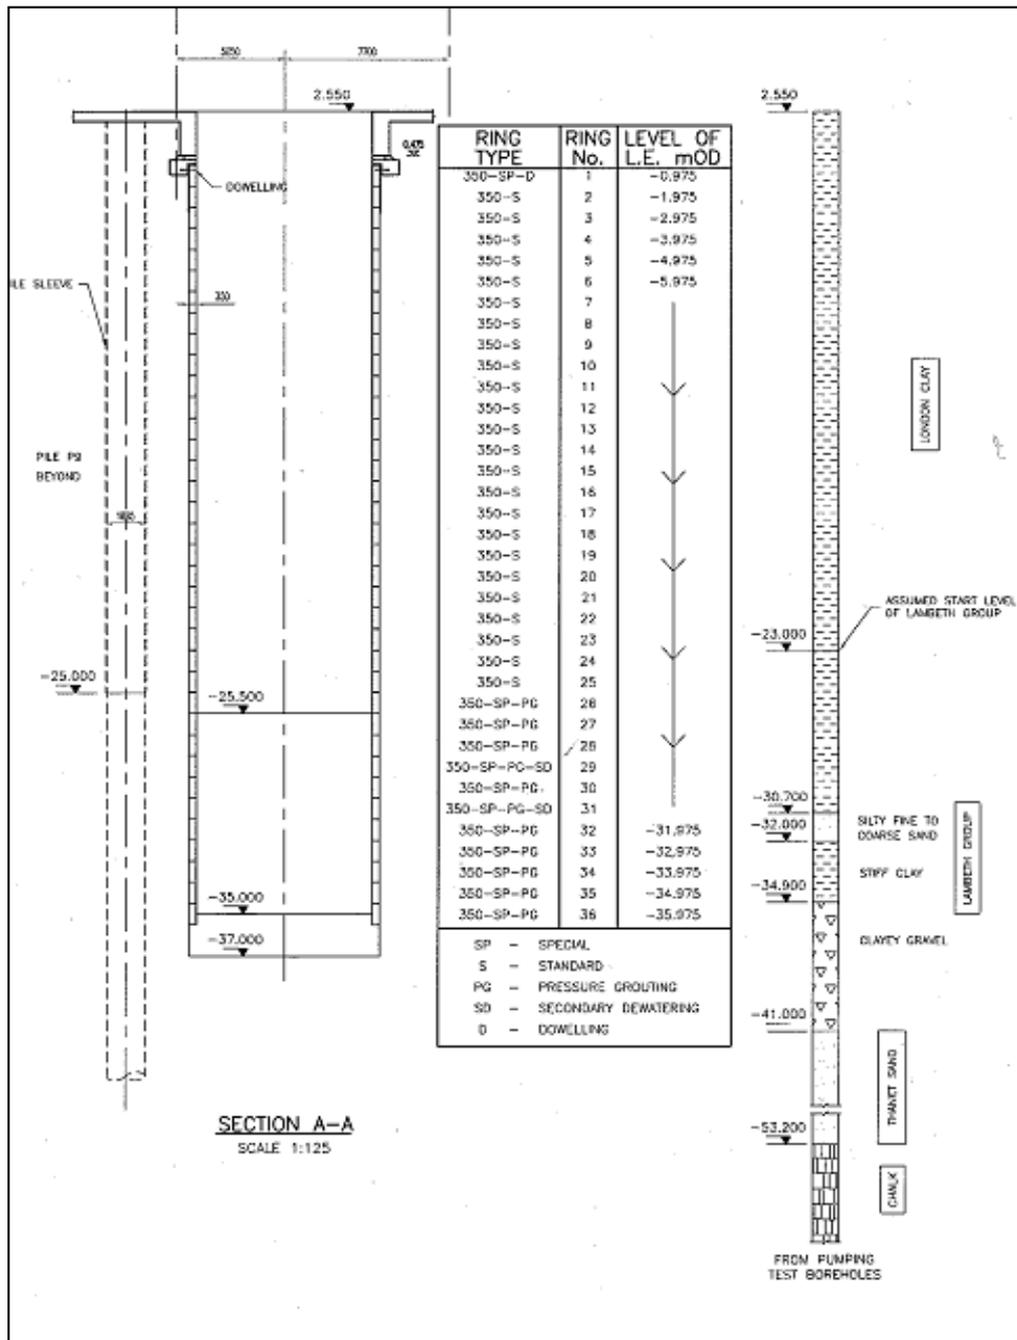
Section of Draught Relief Shaft with pile and ground condition details
